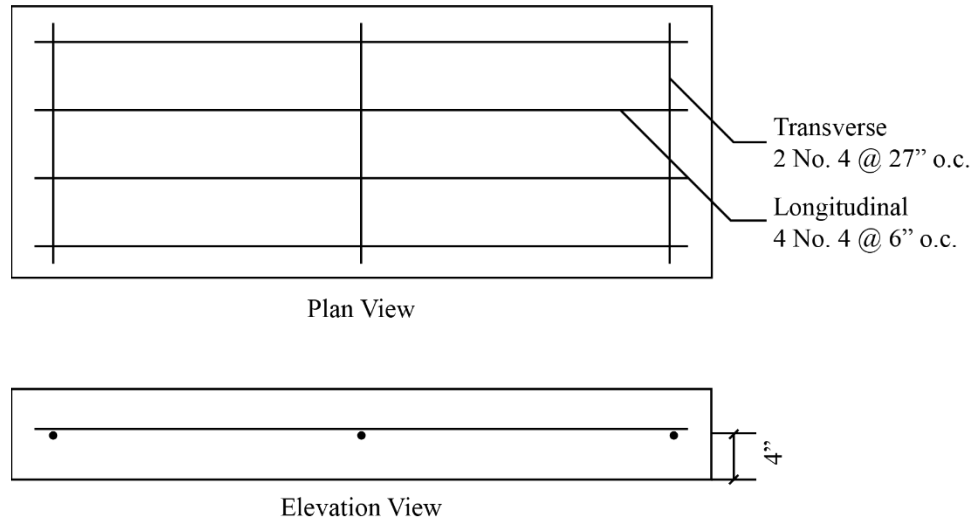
Reinforcing Details for Continuously Reinforced Specimens
